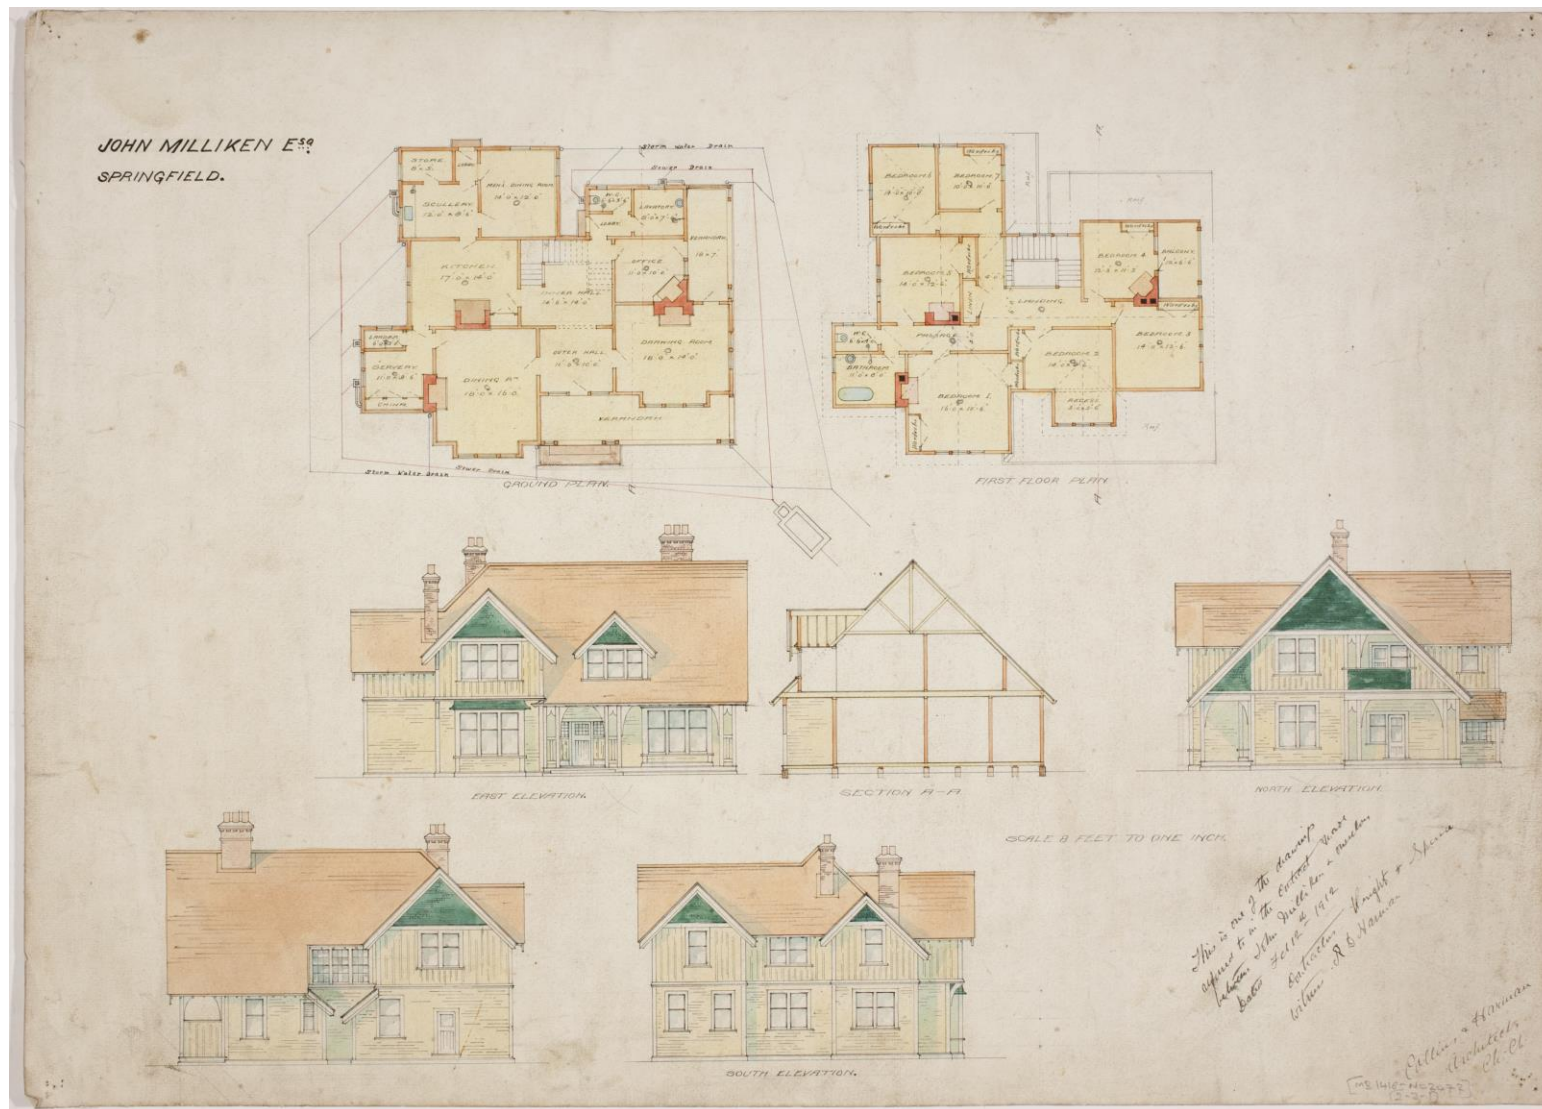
Collins and Harman, John Milliken, Esq., Springfield, plans, elevations and section (1912).
